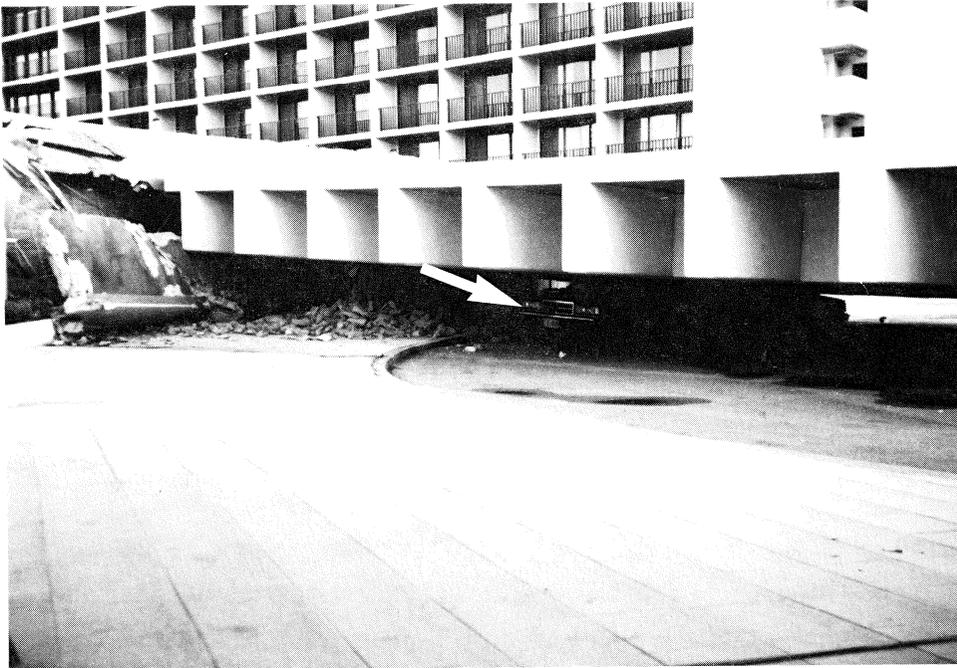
The most severe instance of concrete canopy damage occurred at the Reef Hotel, where crushing of concrete columns dropped a heavy slab onto taxis parked near the entrance.
